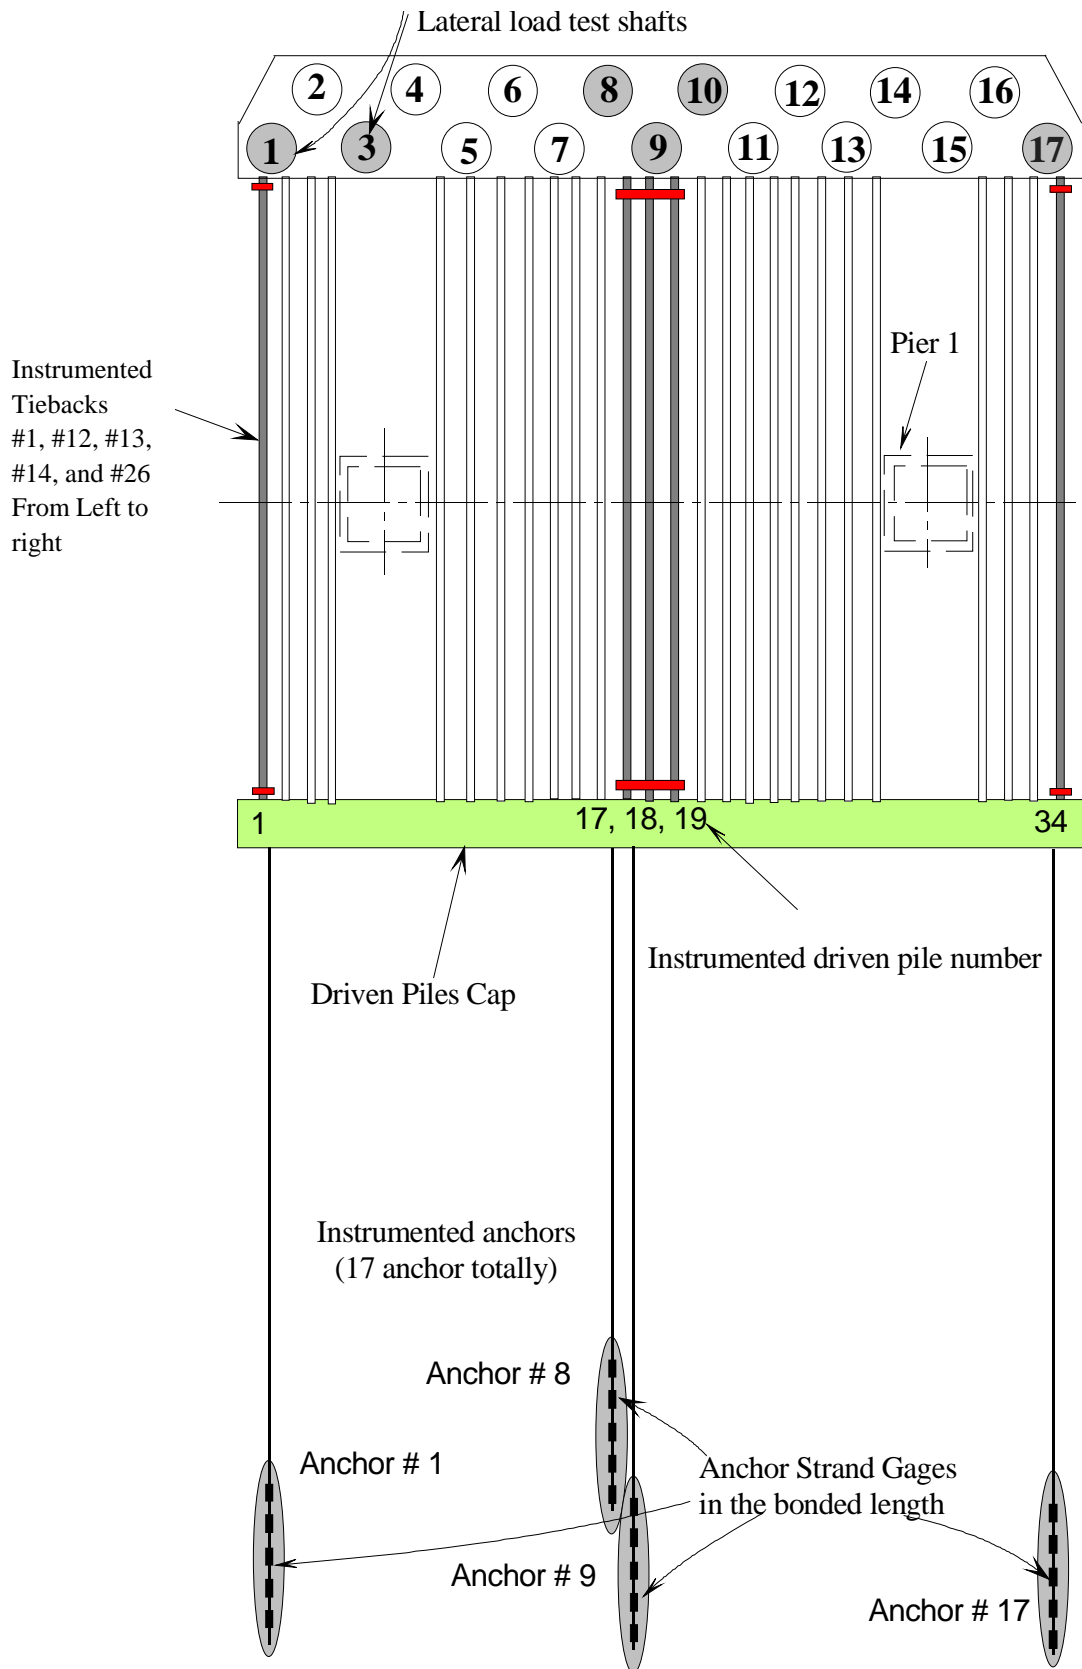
Plan view of the stabilization structure and instrumentation layout
